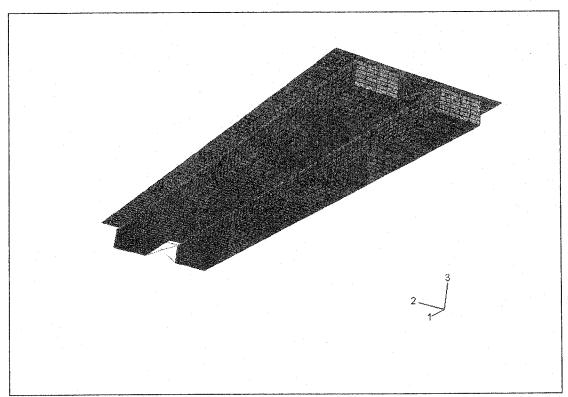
ABAQUS model view of bridge model M3 with concrete deck
